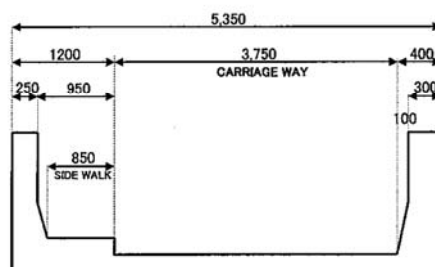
Typical cross section of one-lane bridge (Adjusted to NB load)
